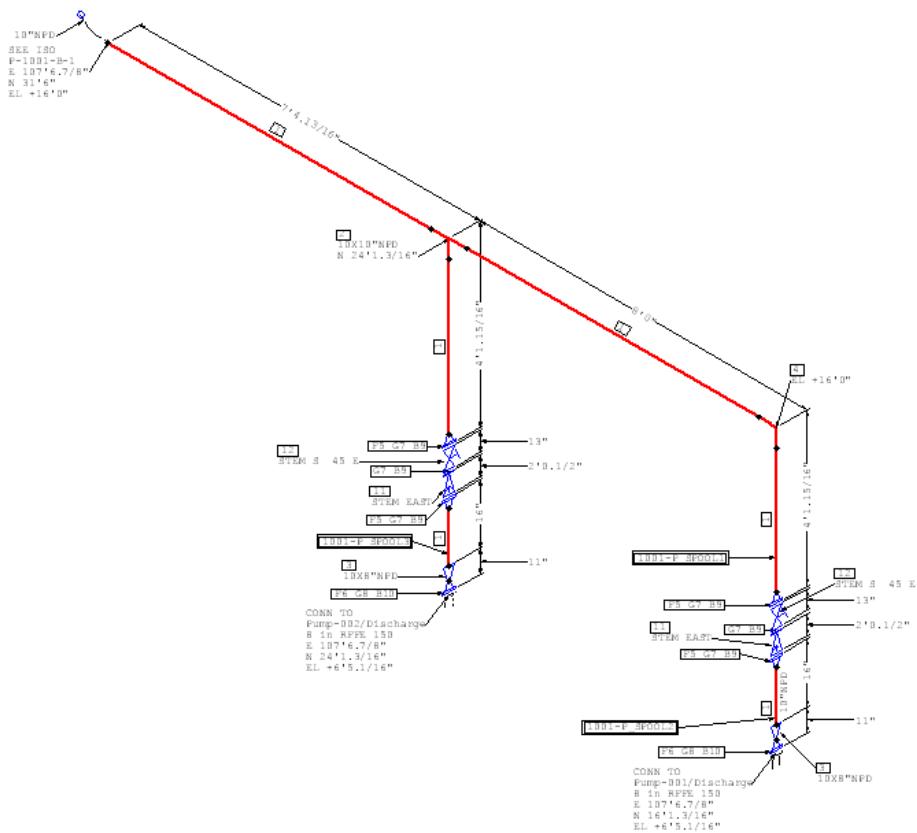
Output: Isometric Drawing from WBS P-1001-A-1
